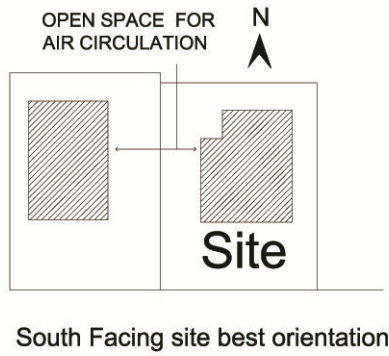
South facing building with solar gain and open space between buildings good for air circulation
